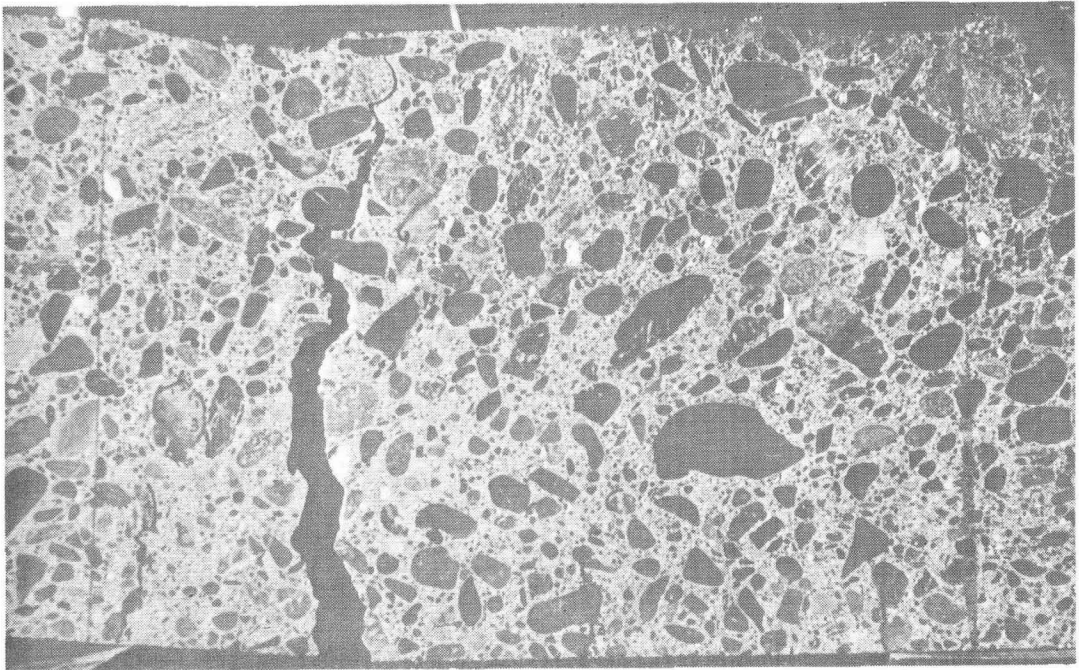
Crack of concrete beam after failure at load, 2.415 tons
